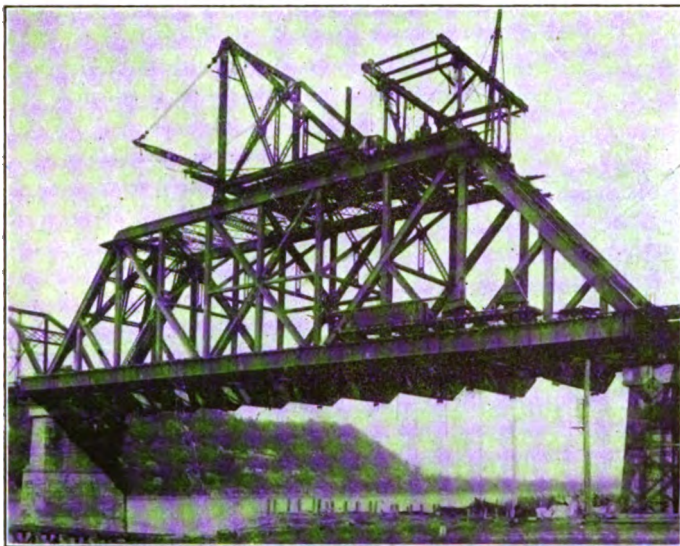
New Span 1 After Removal of Old Trusses Showing Heavy Traveler Erected for Placing Spans 2 and 3.
